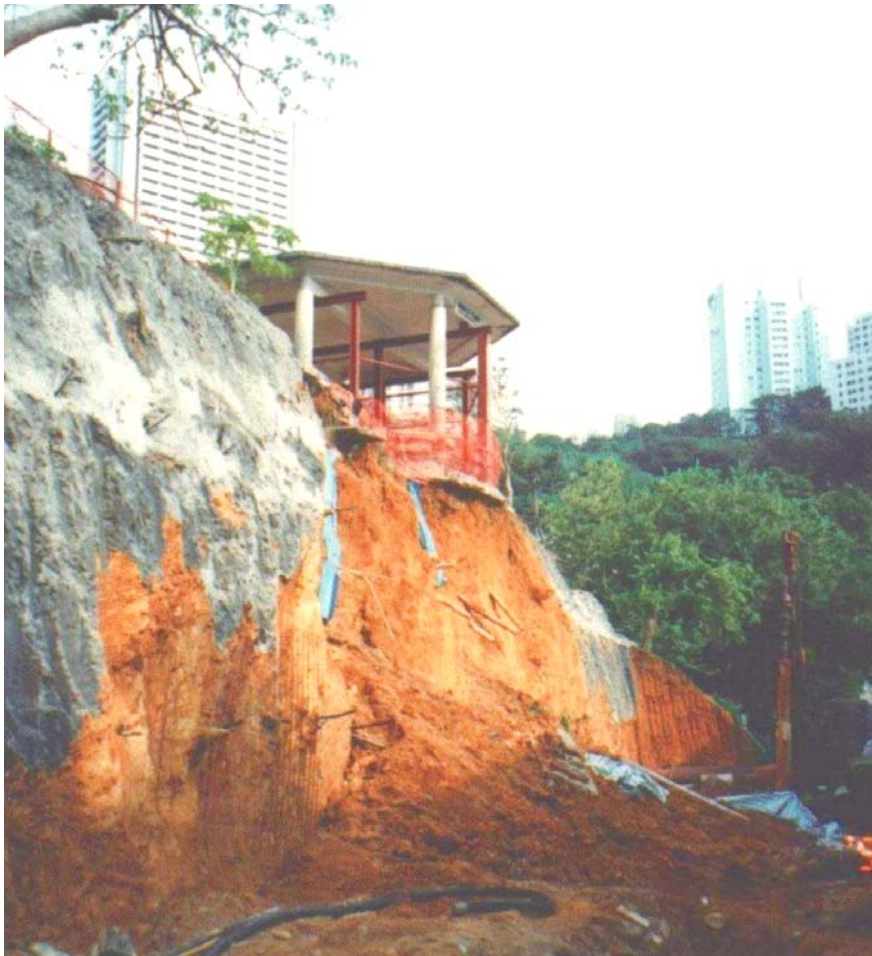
Failure of Temporary Nailed Cut Slope by Sliding off Front of Soil Nails
